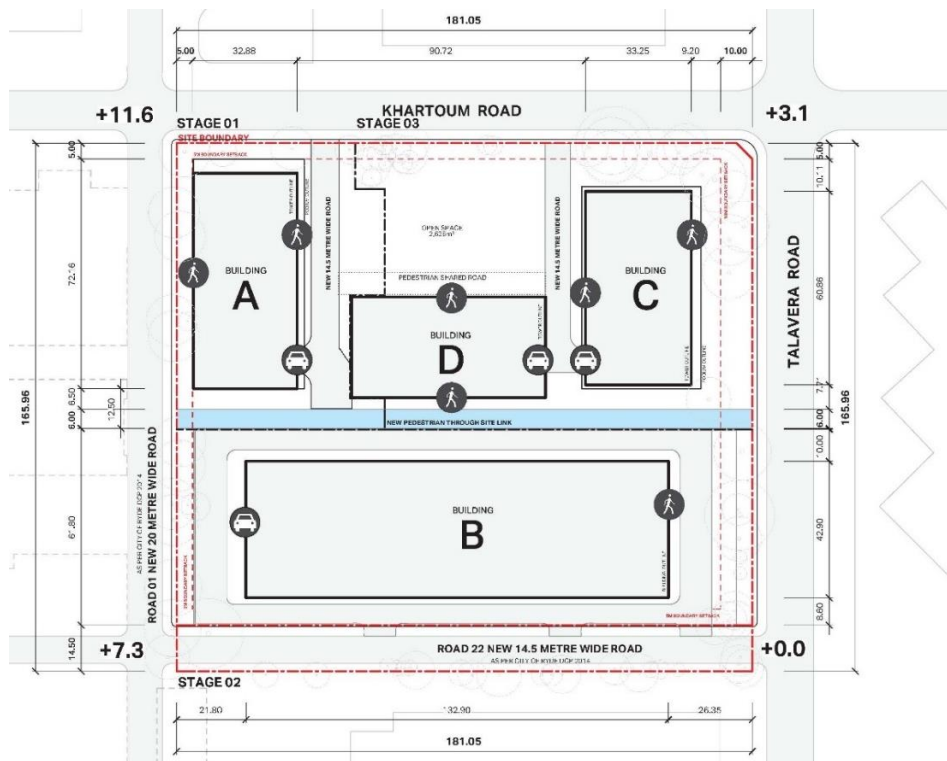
Site plan included in the amending DA (Source: M\_Park architectural package for the amended DA)
